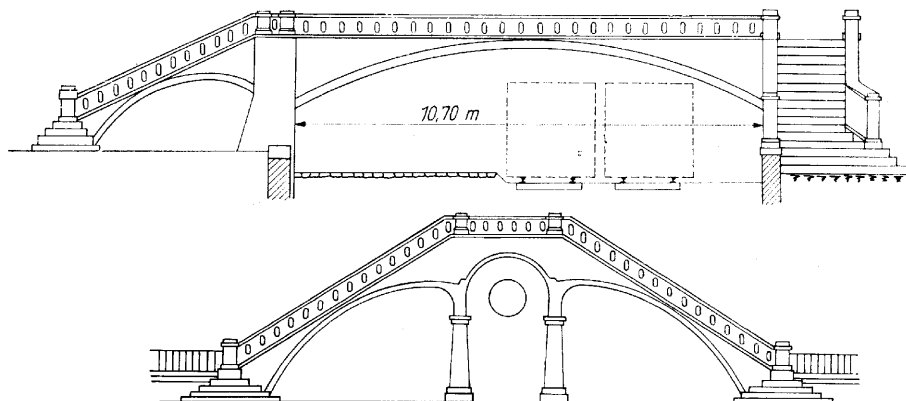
Still existing concrete pedestrian bridge over the surface line of the first European-continental underground in Budapest (constructed in 1894)
